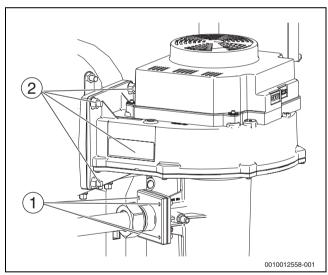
Removing the fan (boiler rating 150-300 kW)
